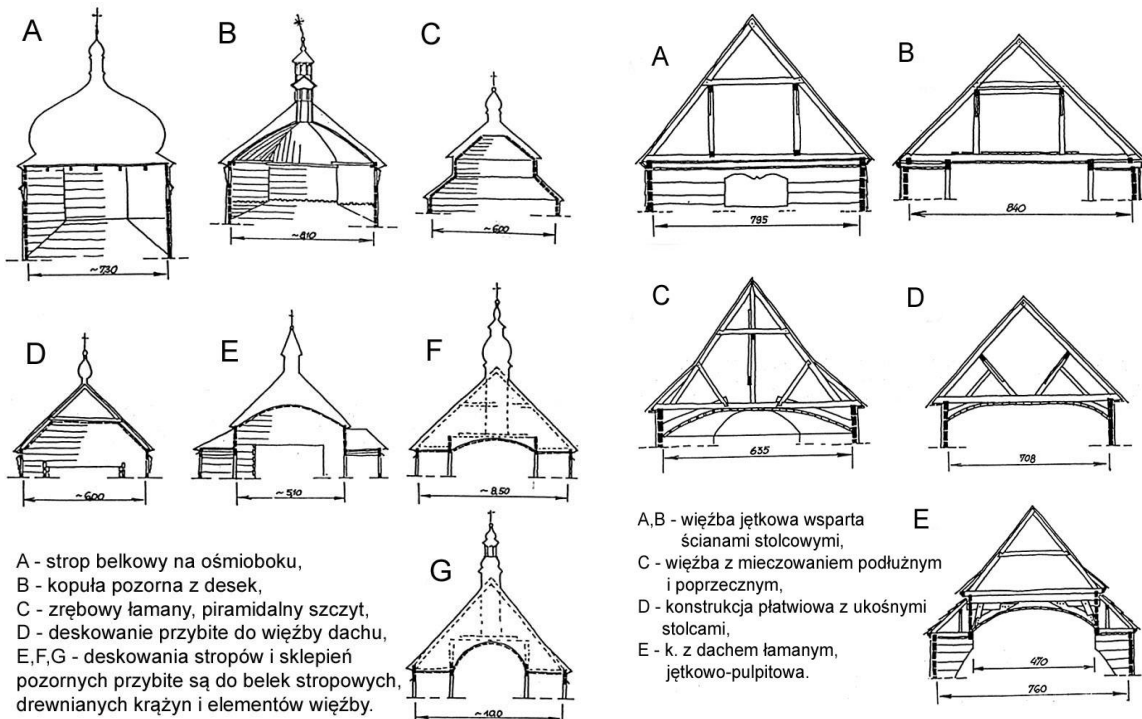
Examples of different types of “domes” of wooden Orthodox churches: A - beam ceiling, B - apparent dome, C - broken log structure, D - with formwork attached to the roof structure, E, F, G - ceiling and vault formwork nailed to the ceiling beams and roof structure.. Source: Kurek 1997.
